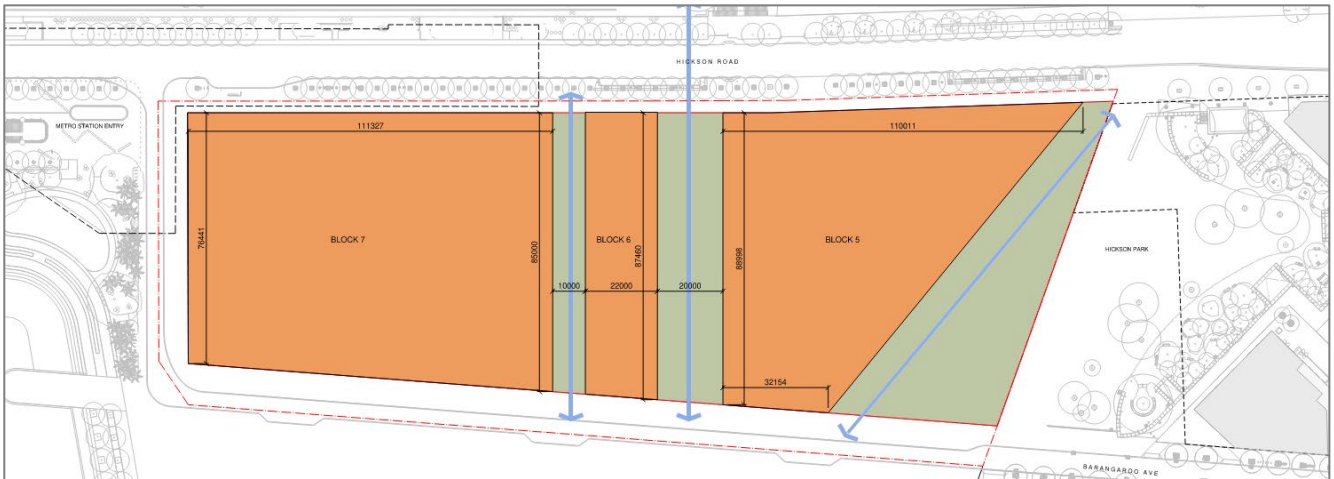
APPROVED CONCEPT PLAN (SJB)
